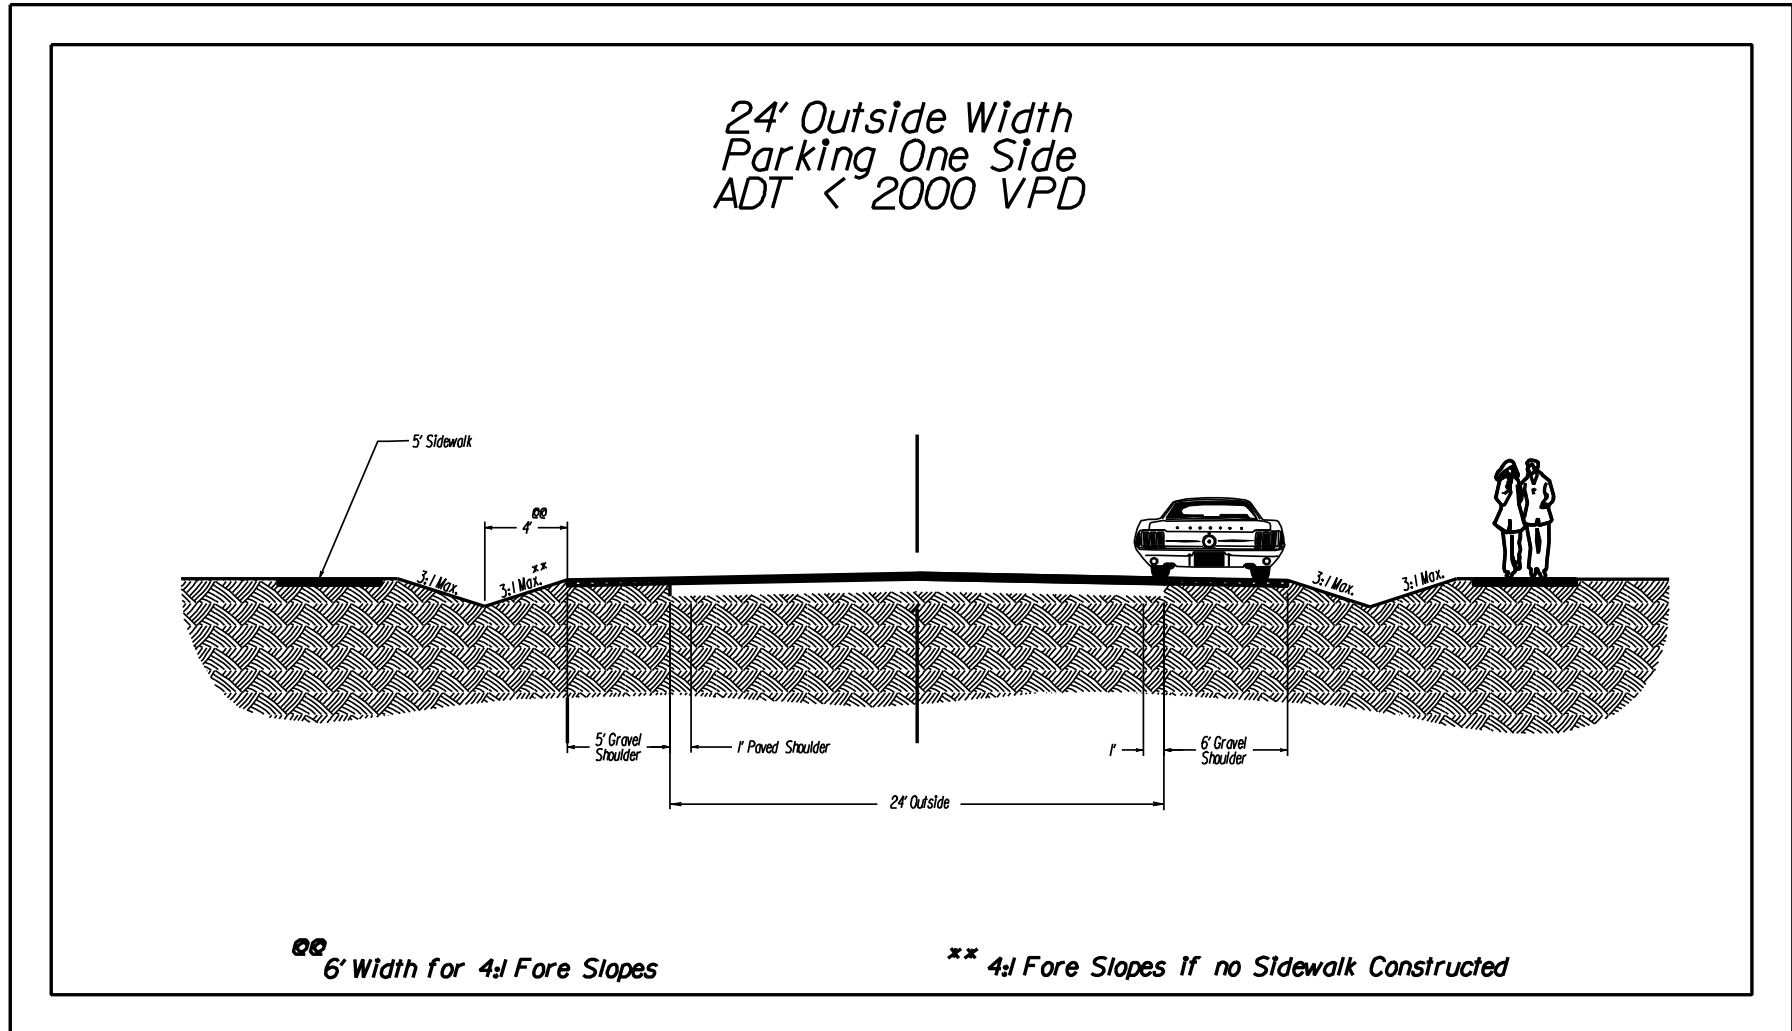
24' OUTSIDE WIDTH PARKING ONE SIDE
